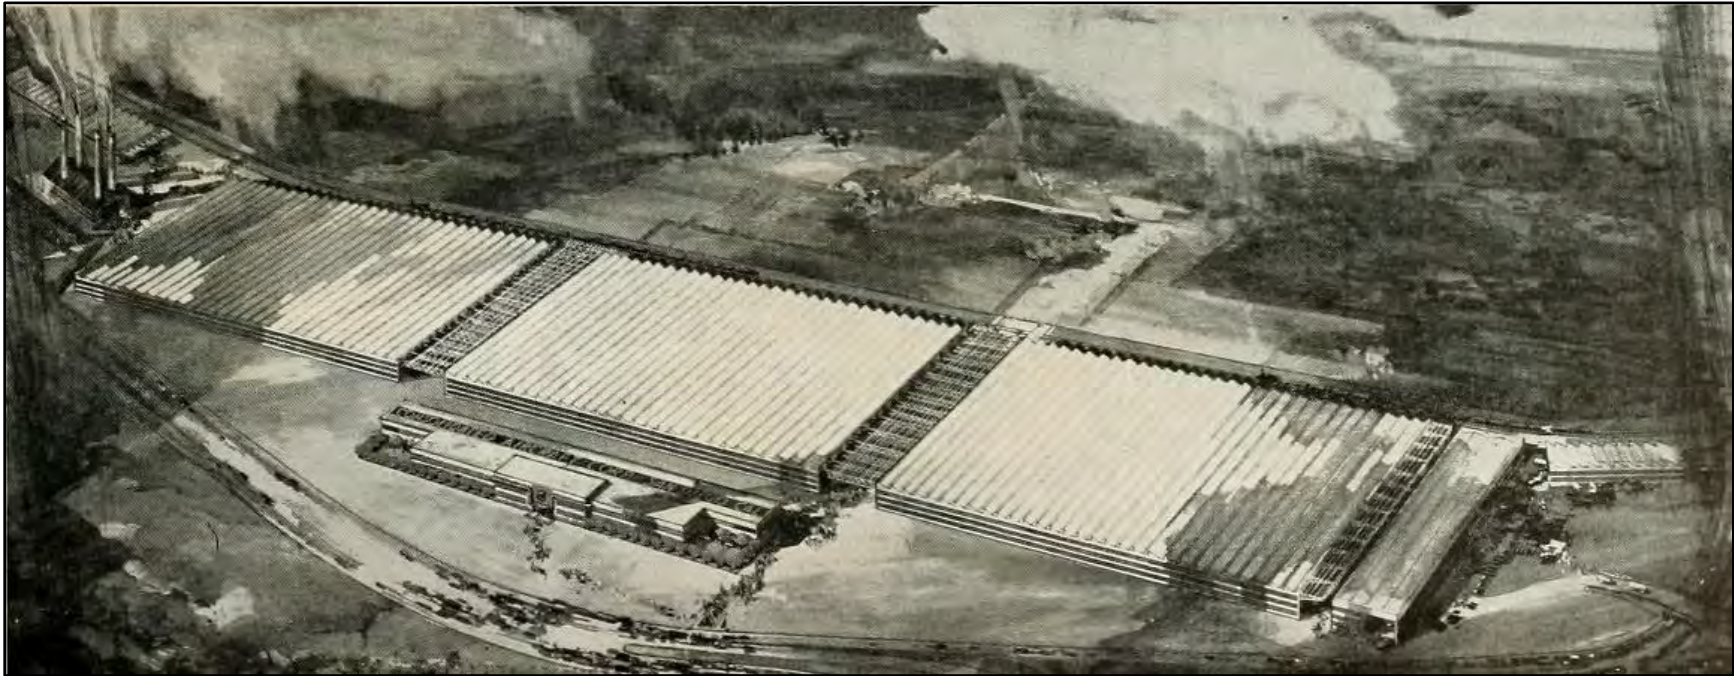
Architect's Rendering of Plant 2, 1.3 Miles North of Plant 1
